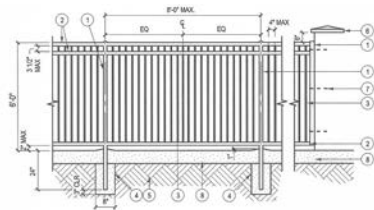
CONCEPTUAL WALL AND FENCE PLAN
